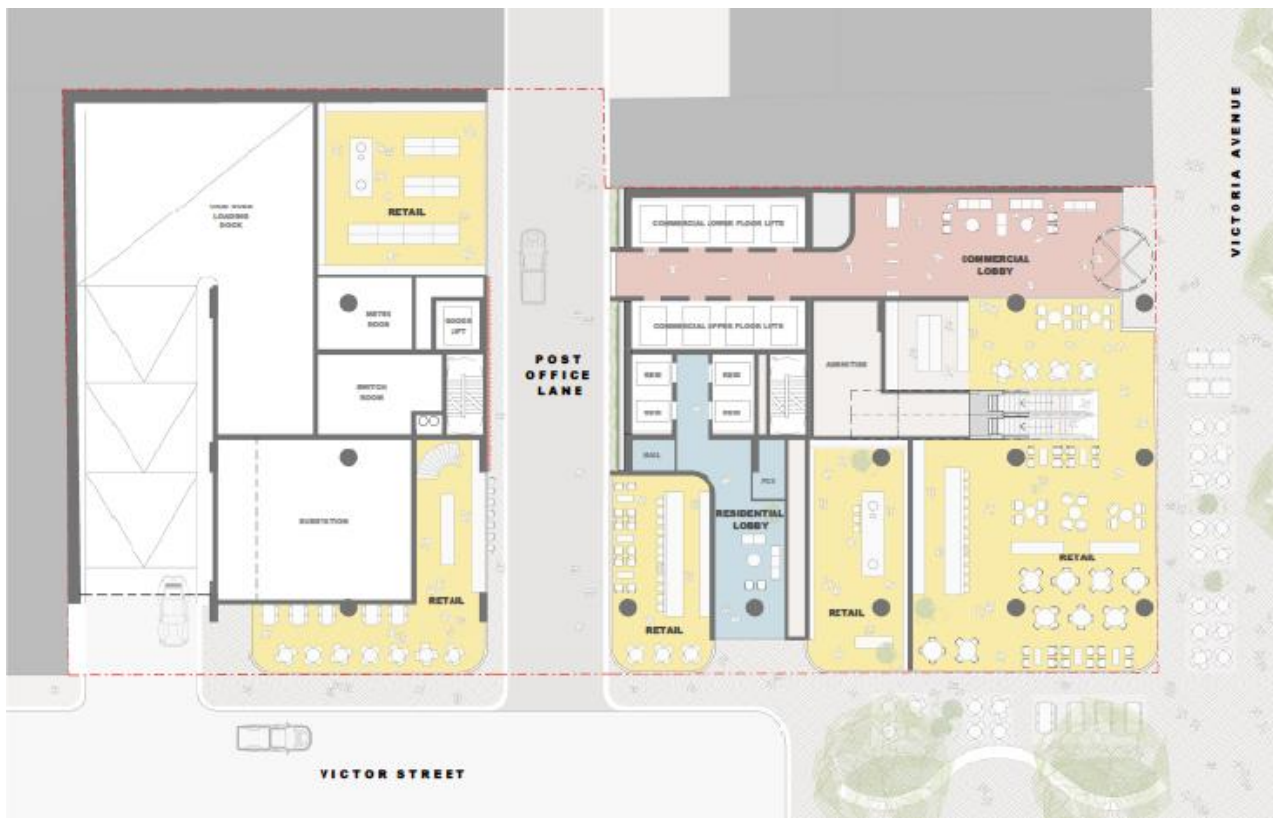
Concept of the proposed ground floor level (source: Mirvac Design)
